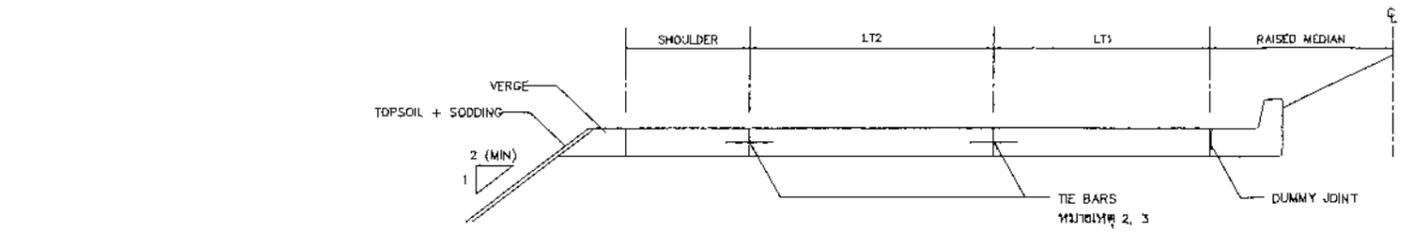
DETAIL OF JOINT BETWEEN NEW AND EXISTING CONCRETE PAVEMENT (LONGITUDINAL JOINT)
